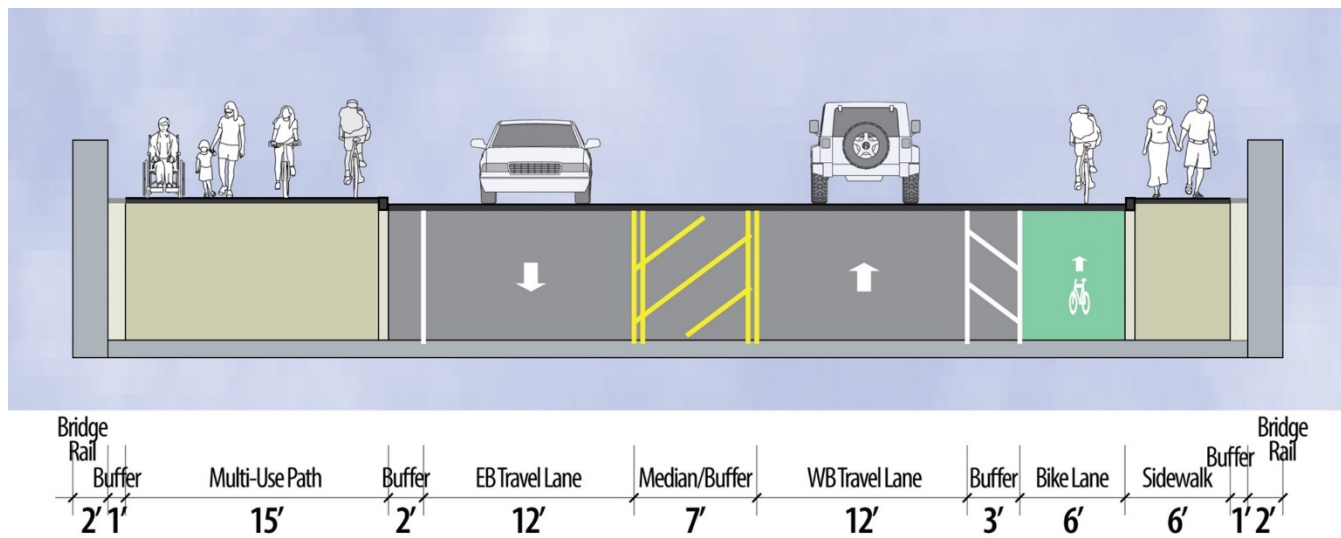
CROSS SECTION OF THE BAKER ROAD OVERCROSSING OF US 97, FACING WEST (ASSUMES A ROUNDABOUT IS CONSTRUCTED AT THE NORTHBOUND RAMPS)
